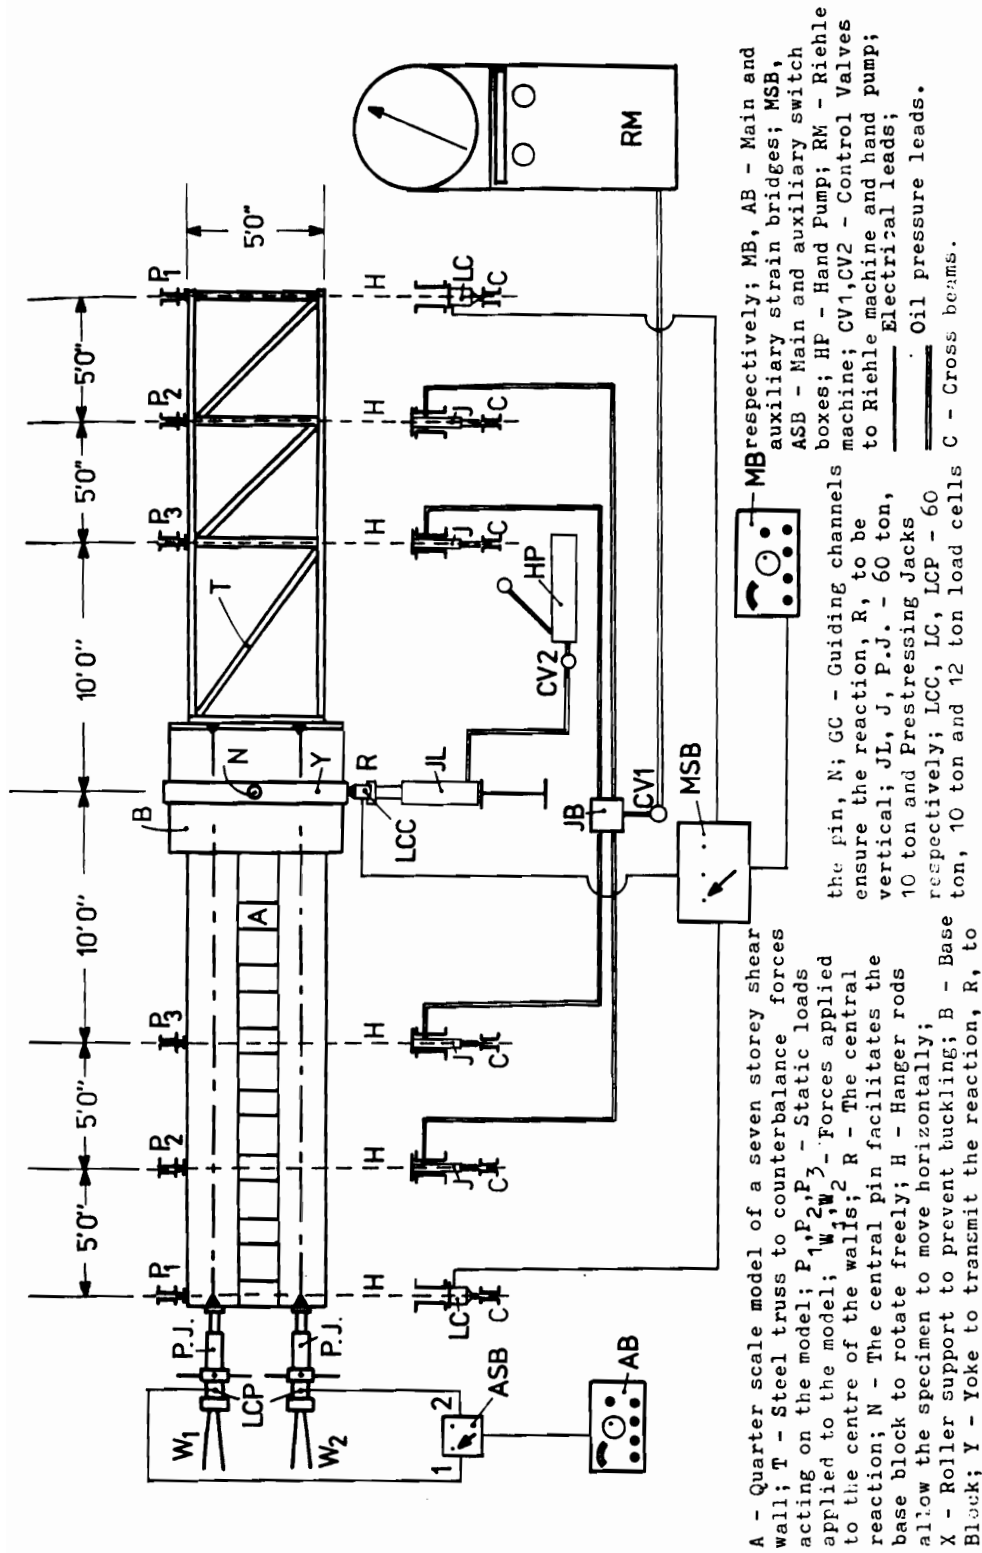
Test set up for walls tested by Santhakumar (1974)
